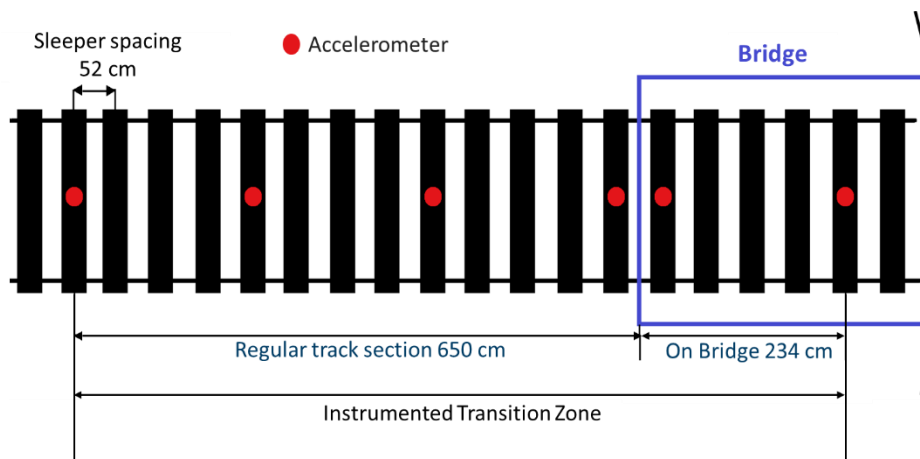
Placement of accelerometers in the transition zone of Sørsterbekk bridge 2 on one side of the bridge. Similar installation is also used in the transition zone on the other side of the bridge.
